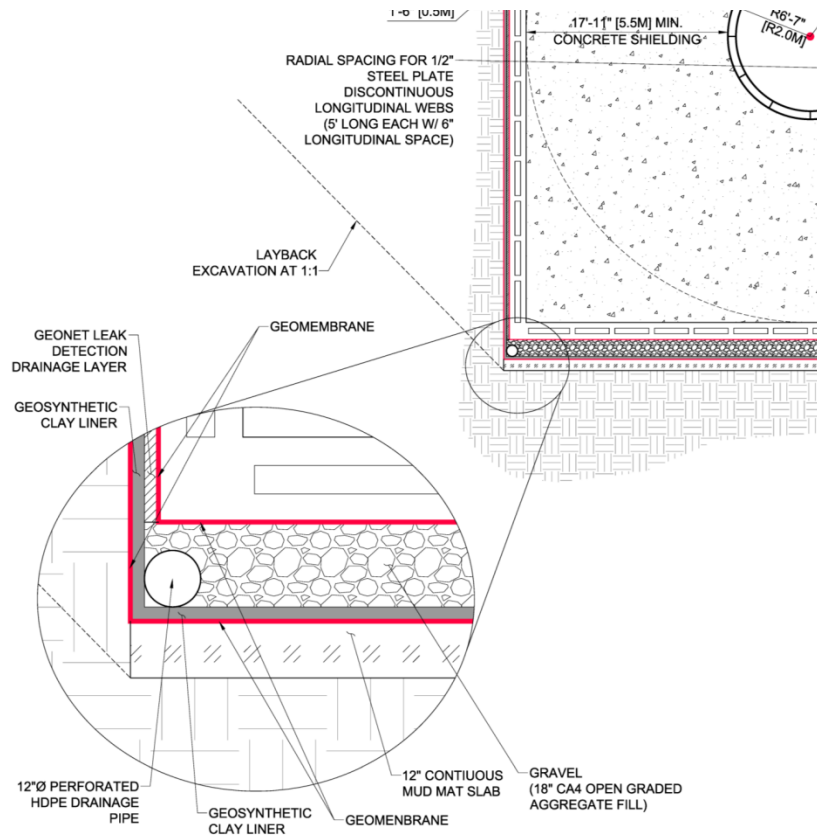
Decay Pipe cross section showing the base of the Decay Pipe barrier system.
